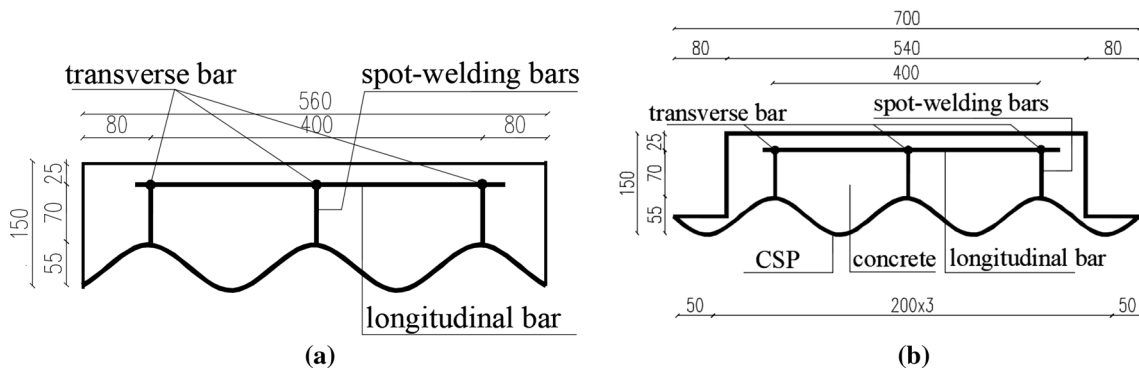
Cross-sections of members. a Cross-section of plate (mm). b Cross-section of arches (mm)
